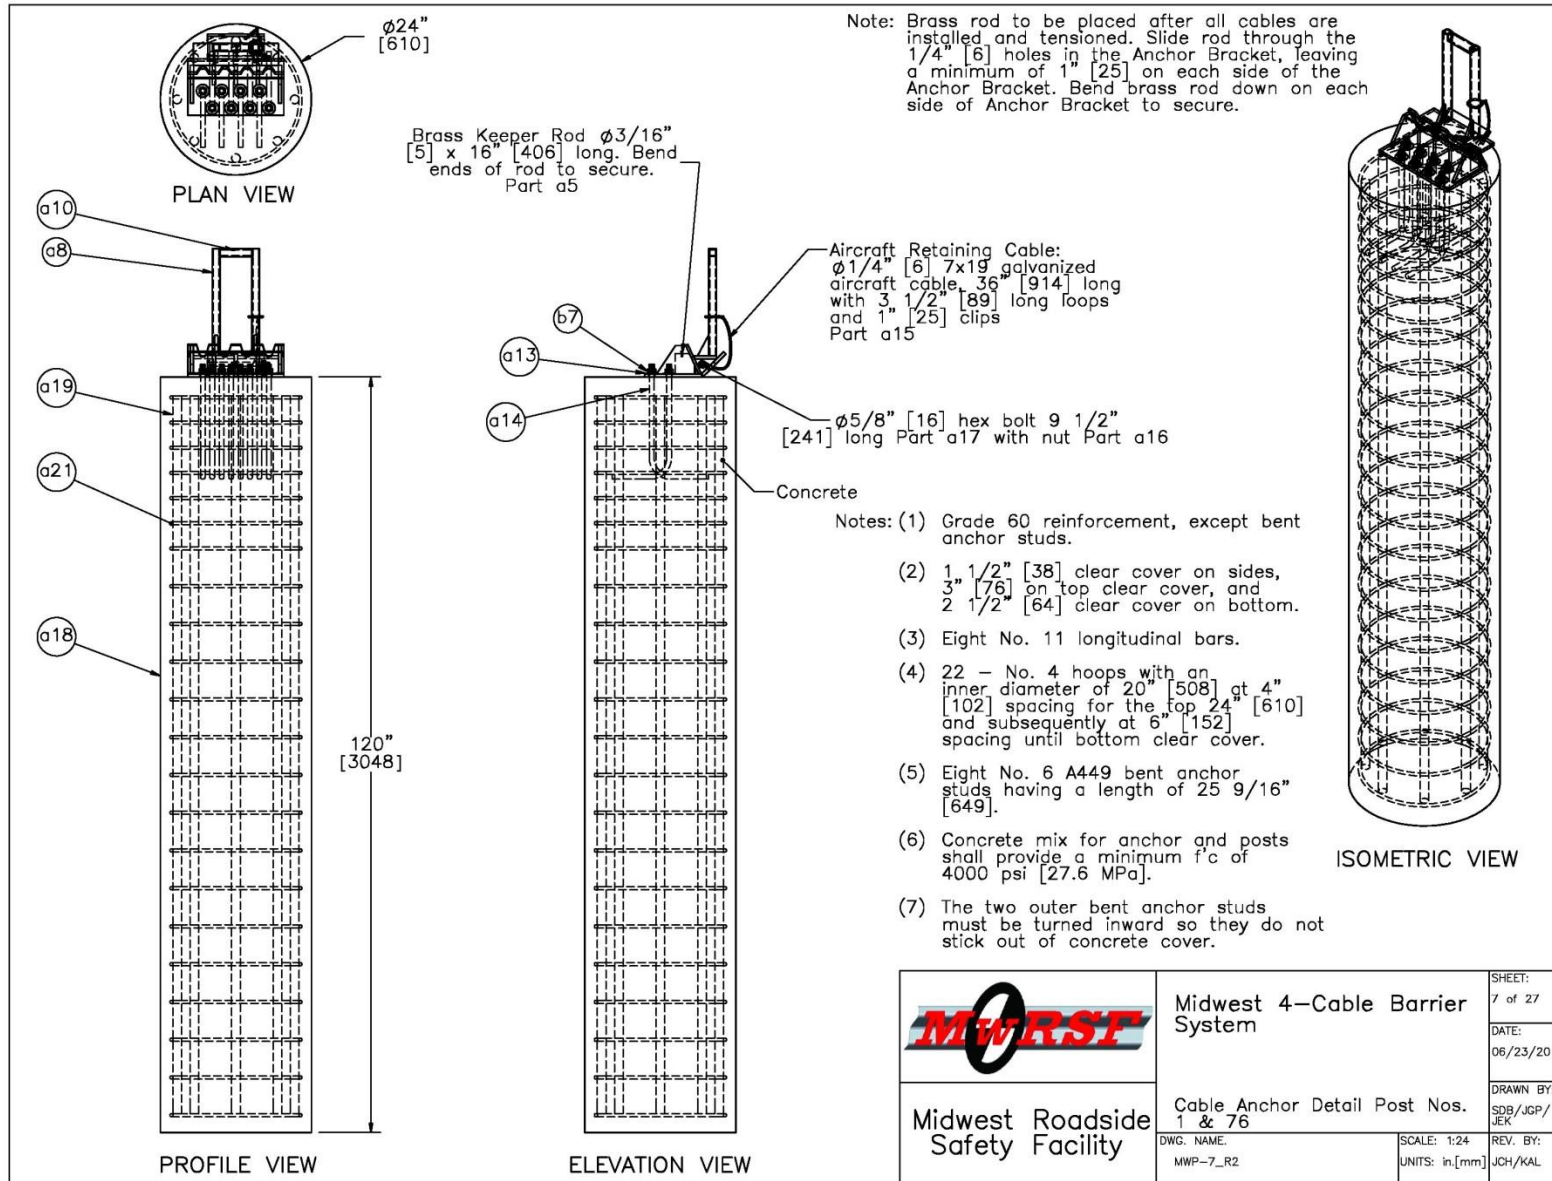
Cable Anchor Foundation, Post Nos. 1 and 76, Test No. MWP-7
